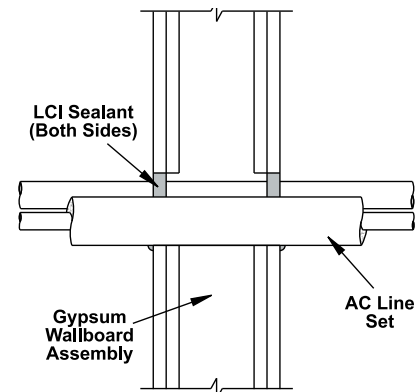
BARE & INSULATED METALLIC PIPES - Gypsum Walls
